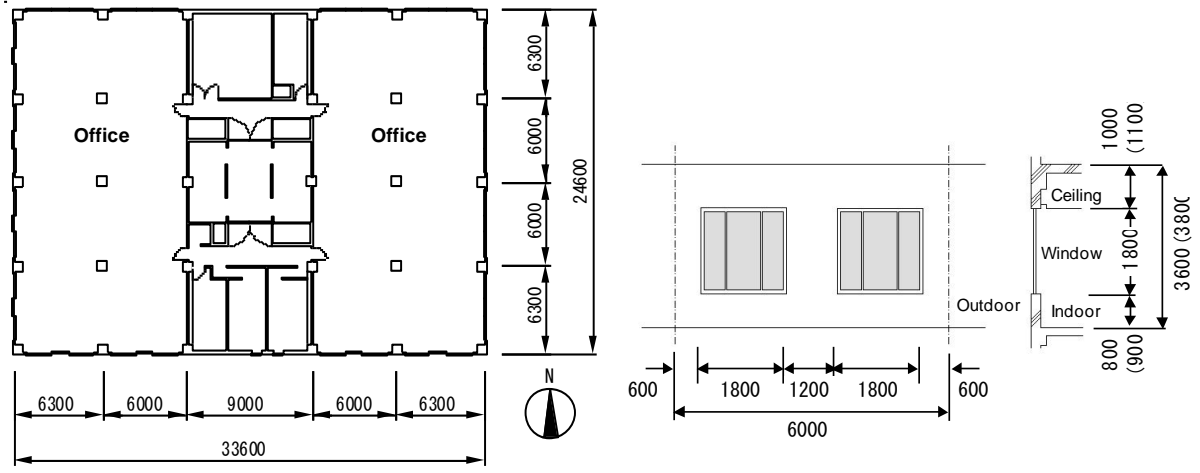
Building model (floor plan and elevation partly in section of base floor)
